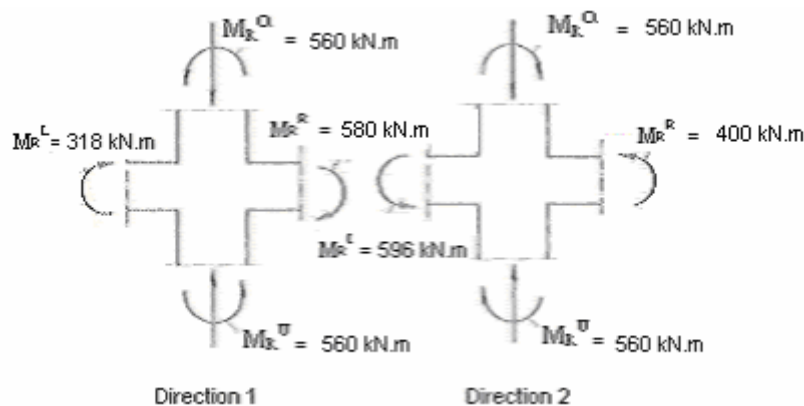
Strong column weak beam connection at the interior connection N6 and N7
